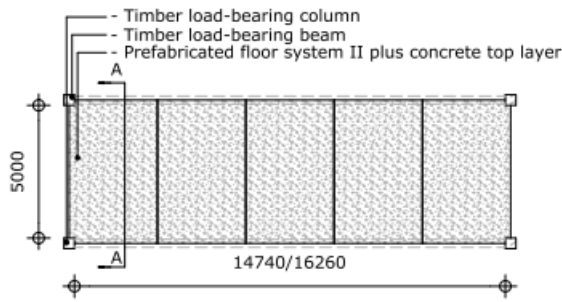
Global layout prefab timber floor system II plus a concrete top layer in mm
